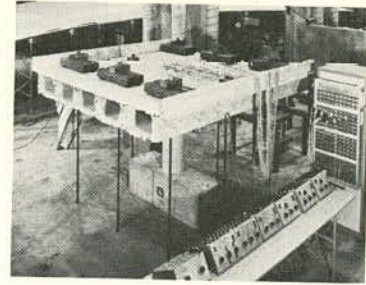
View of Test of Bent Cap Portion of Single-Column Model Bridge
